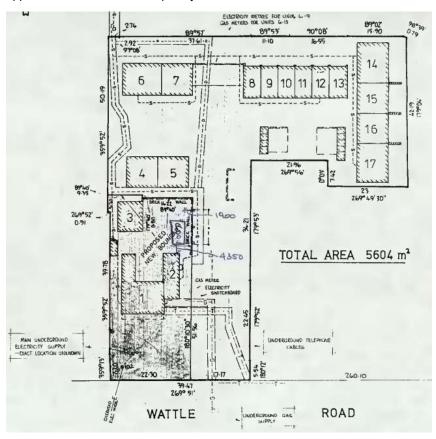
1982 Plan of Transfer showing Block A (marked as dwelling 3) being transferred to a new subdivision which also included the original Knottywood residence (marked as dwelling 1 & 2). (Source: Culliver & Sim, courtesy of City of Boroondara, BH_86_4190-63)
